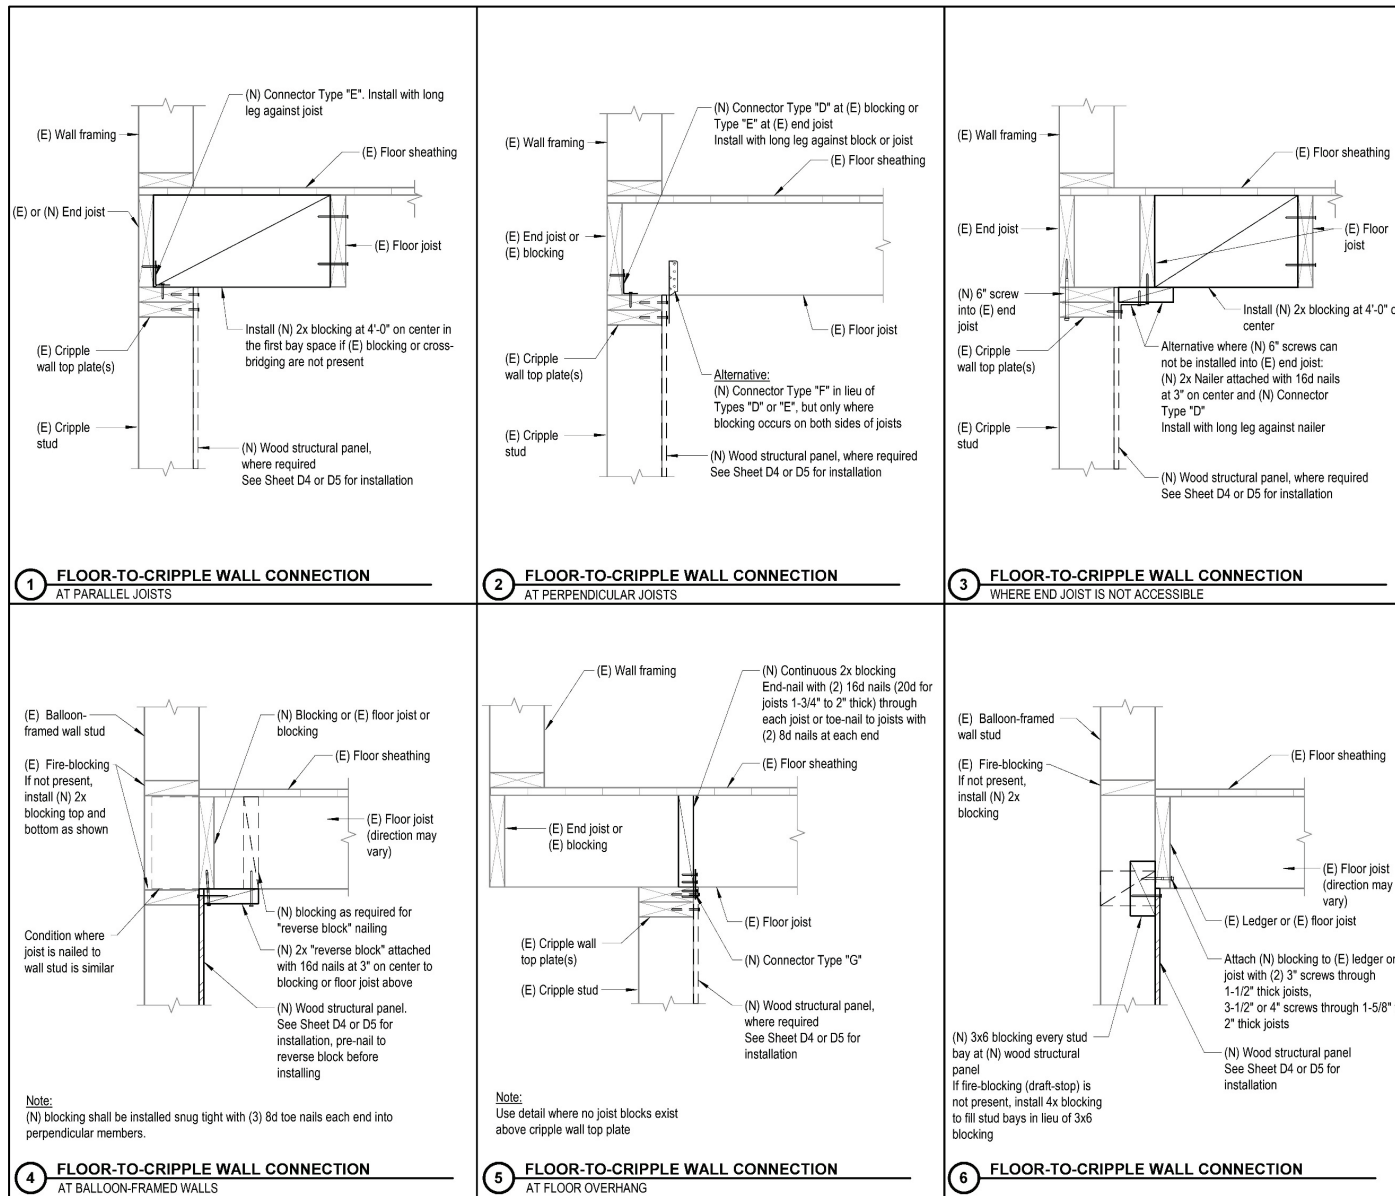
Floor framing to cripple wall connection details. Sheet D3.
